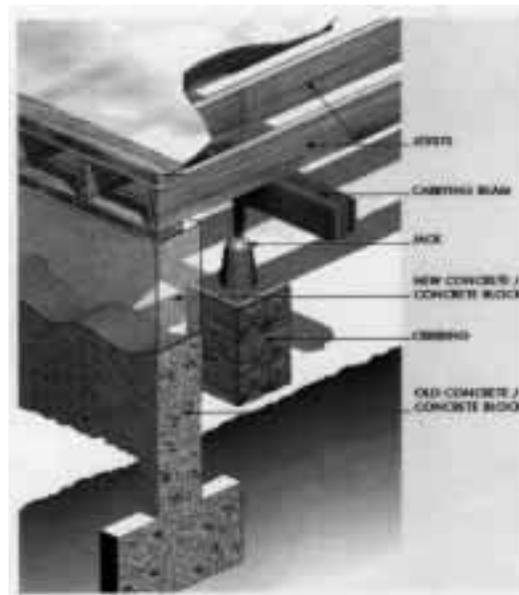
JACKING A WALL WITH PERPENDICULAR JOISTS
